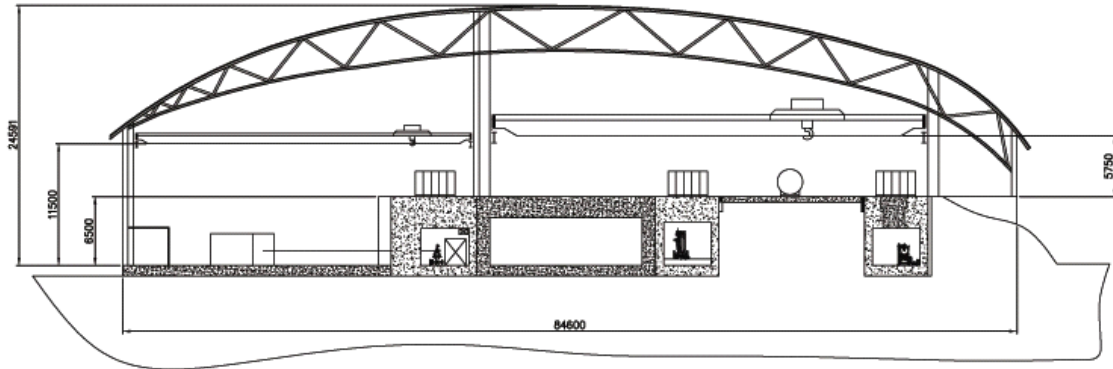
4GLS concept building design plan view cross section (dimensions in mm)
